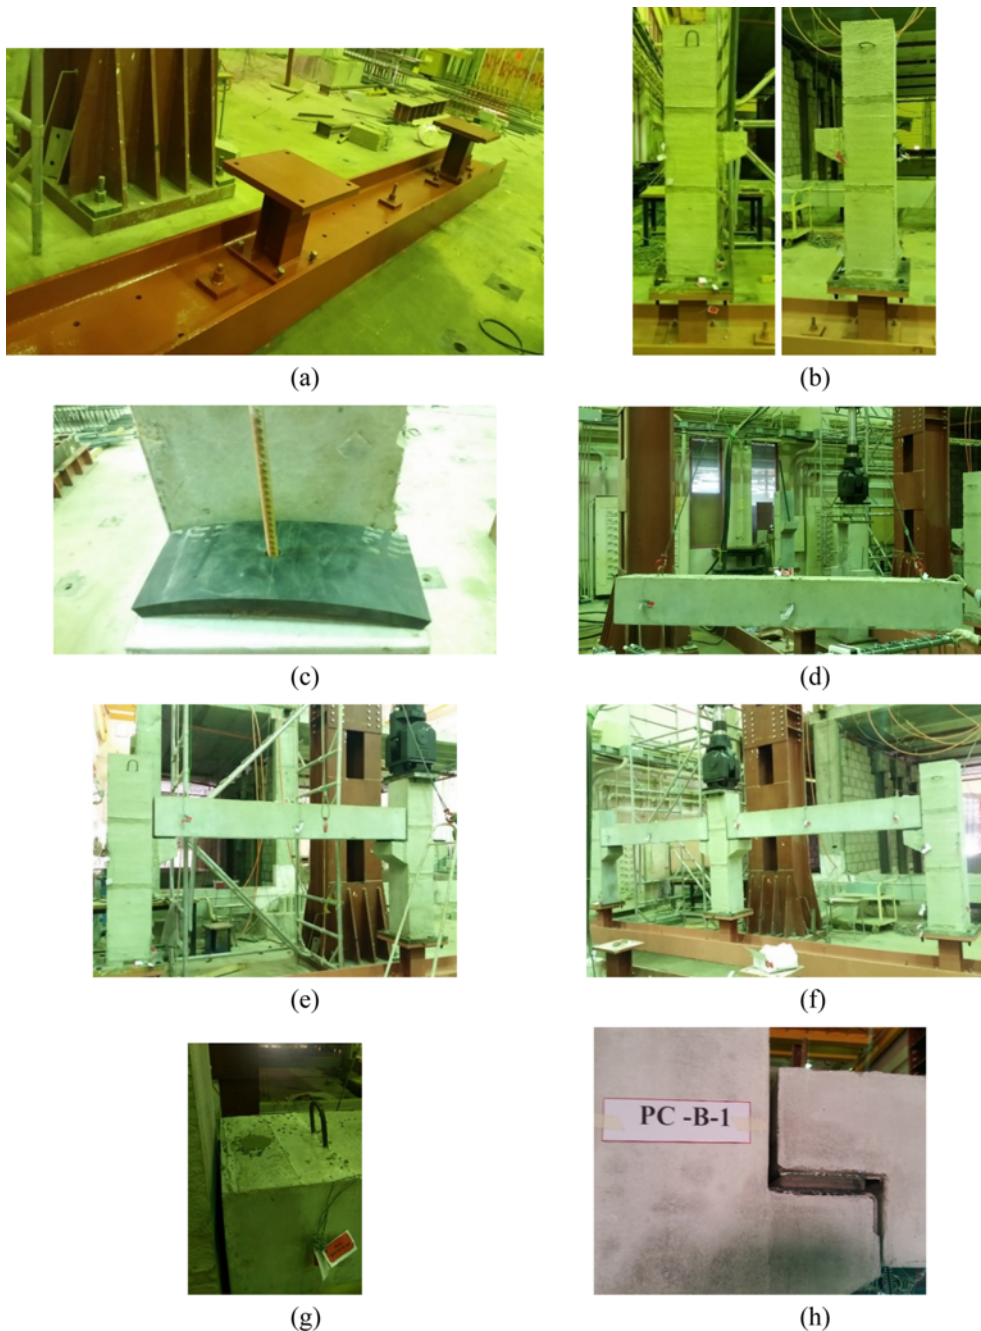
Assembly of Precast Specimens on Test Rig: (a) Steel Rail for Supporting Test Specimen, (b) Columns Erected on Steel Rail, (c) Neoprene Pad Placed on Column Corbel Before Beam Resting, (d) Beams Being Carried by Overhead Crane for Erection, (e) Beam Erection Completed using Overhead Crane, (f) Specimen Assembly Completed with all Members Erected, (g) PC-A Specimen Beam Pocket Filled with Grouting Material, (h) PC-B Specimen with Line Welding Along Edge of Embedded Angle
